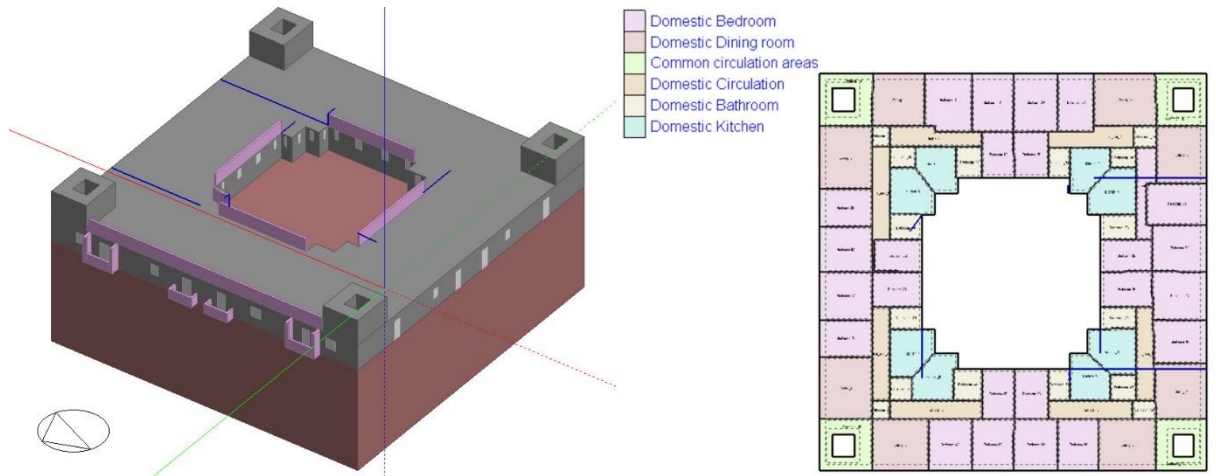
Simplified top floor model on DesignBuilder and top floor plan showing dwellings' configuration
